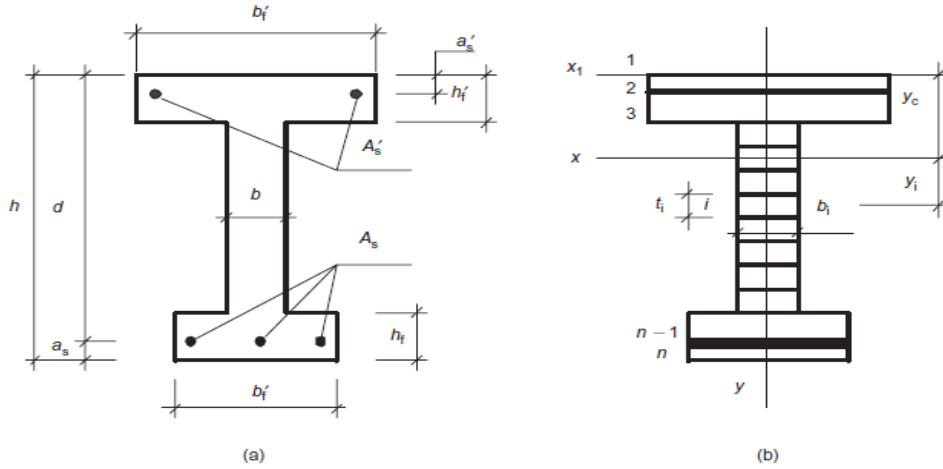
cross-section of doubly reinforced concrete member in layered approach
